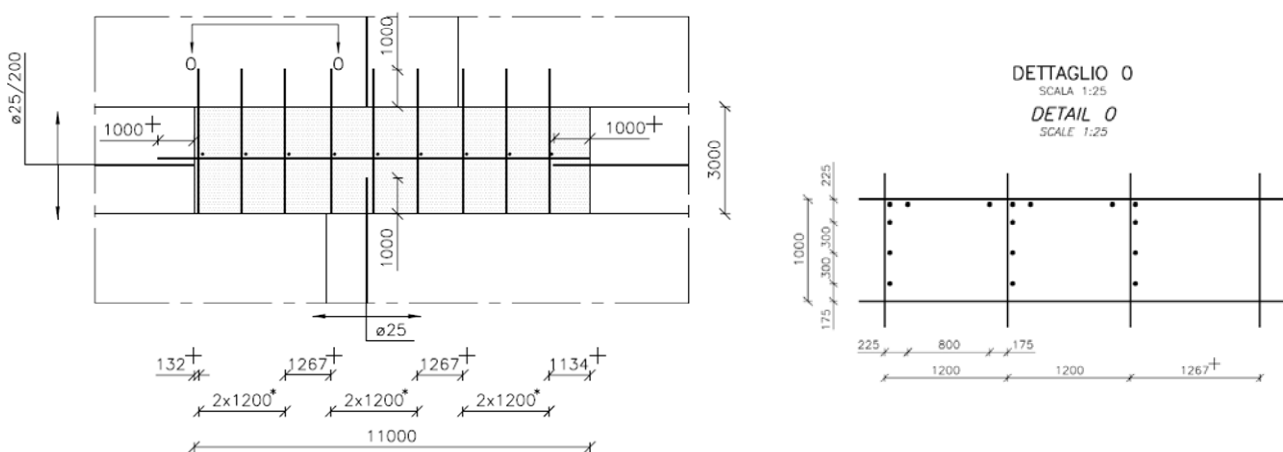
Arrangement of reinforcement 'wall' in global s-z-plane (longitudinal) for the Calabrian anchor block.
